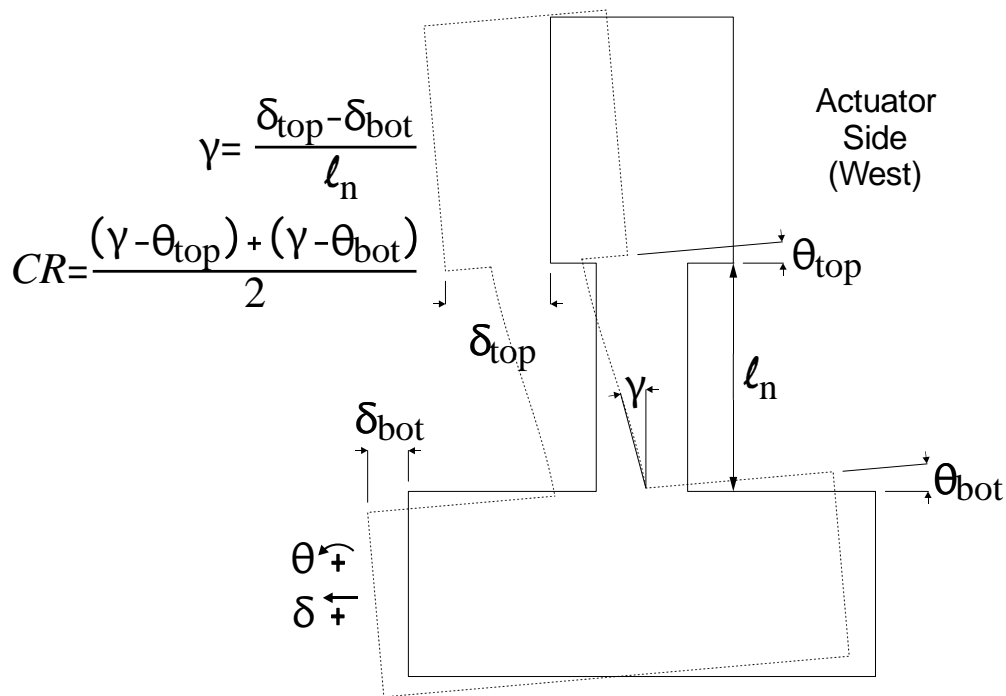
General deformed shape of specimen, view from north<sup>b</sup>
